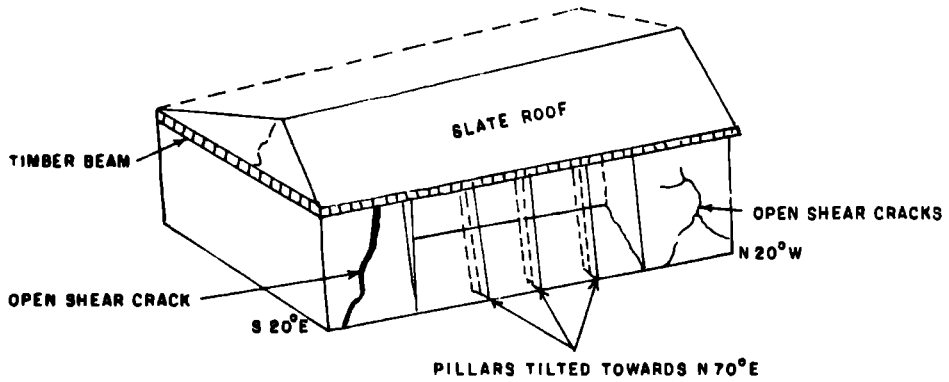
DAMAGES IN THE HOUSE OF SRI SURAT SINGH VILLAGE NALD.
